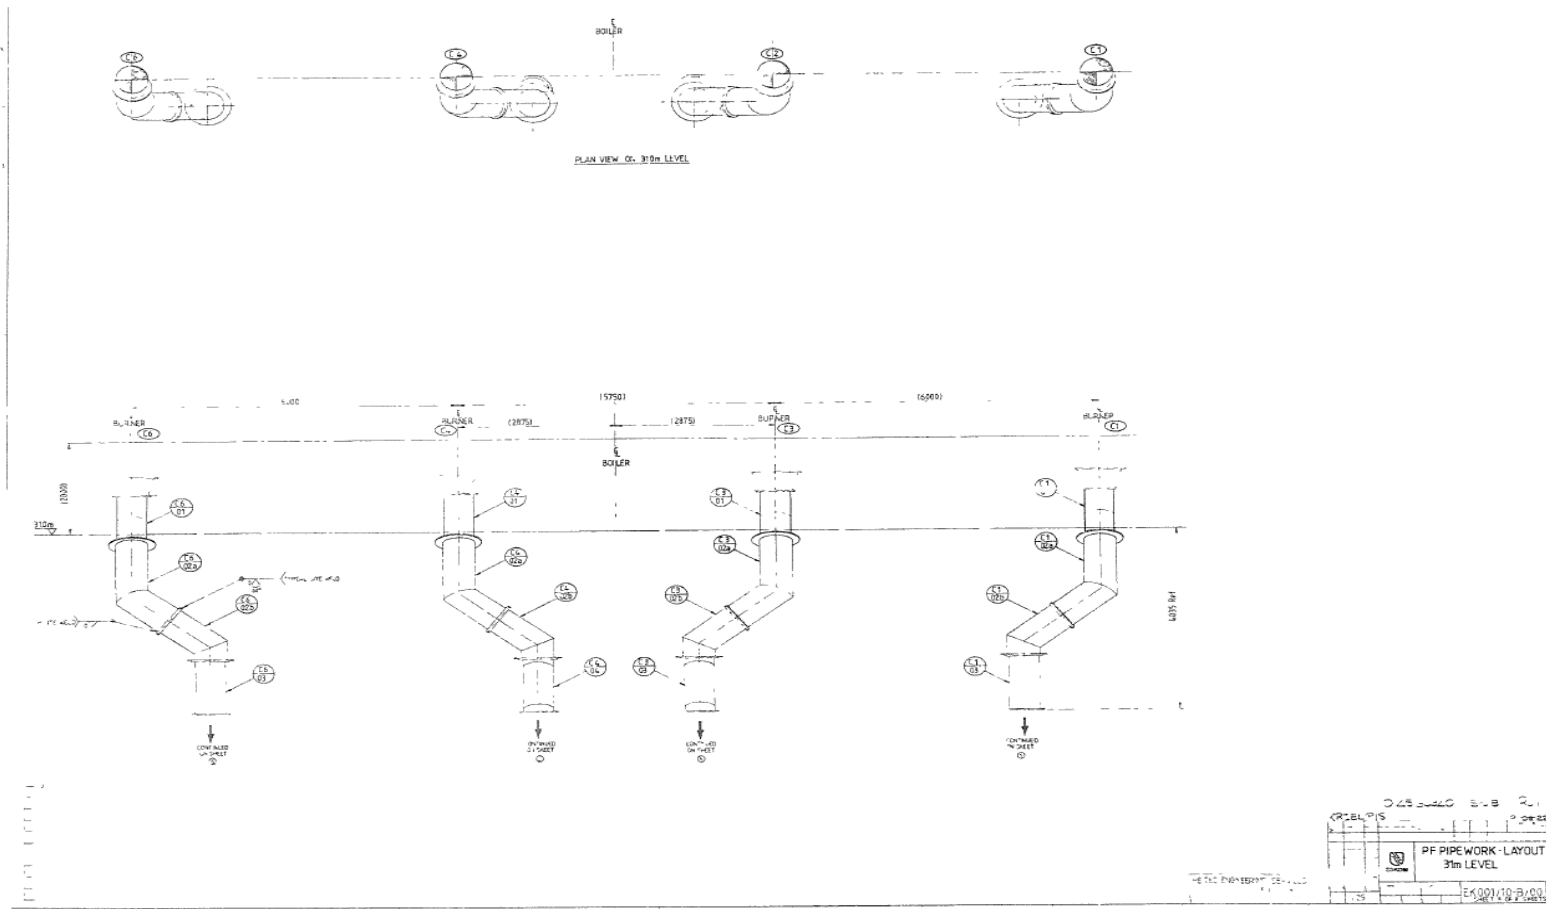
Unit 4-6 Mill C PF pipes arrangements and elevation around the boiler 26ML to 31ML
